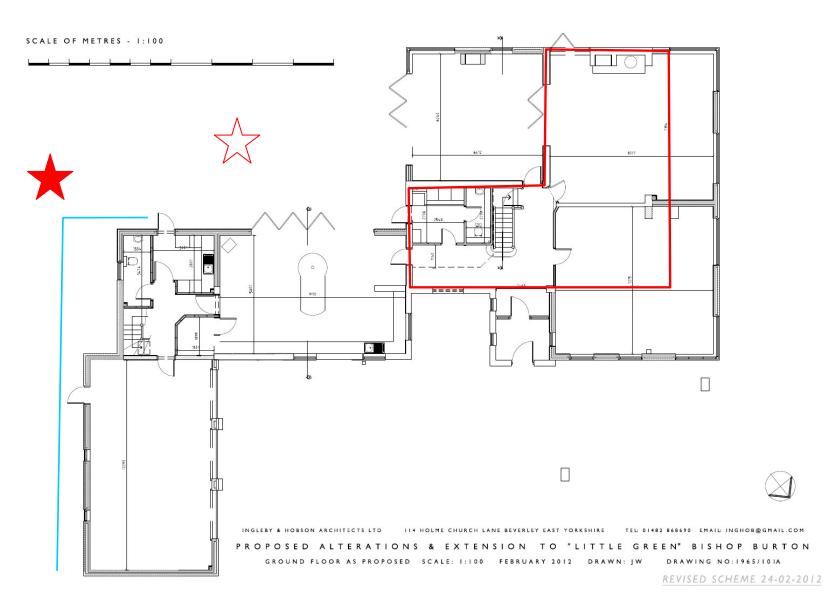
PROPOSED GROUND FLOOR PLAN (plan supplied by Ingleby & Hobson Ltd)
